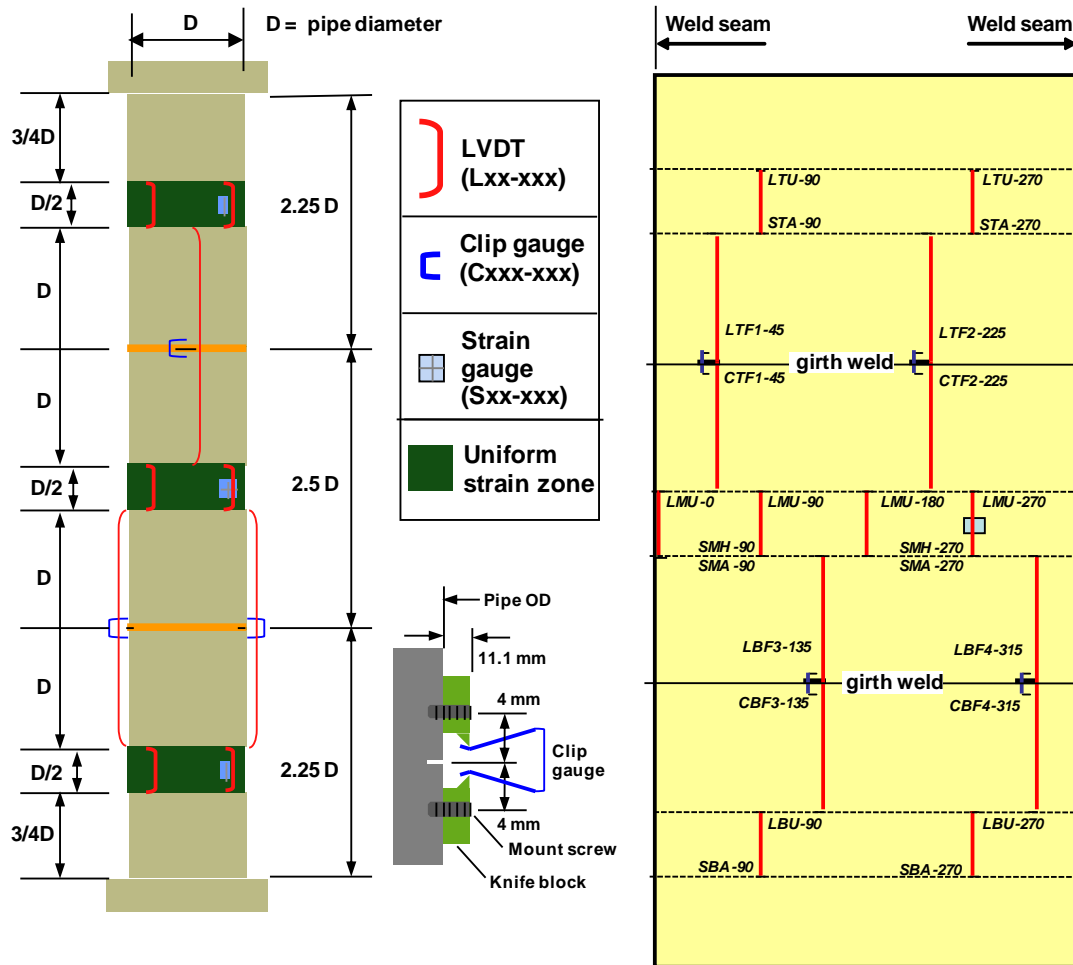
Instrumentation plan of the full-scale pipe tests
